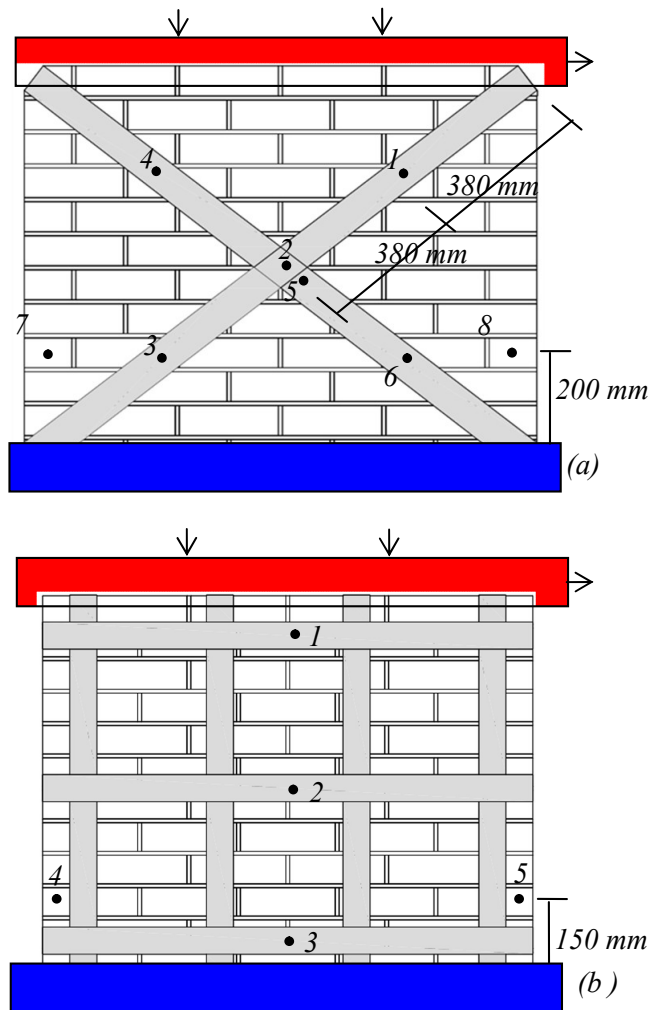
Strain gauges layout (a) cross diagonal layout (b) grid layout
